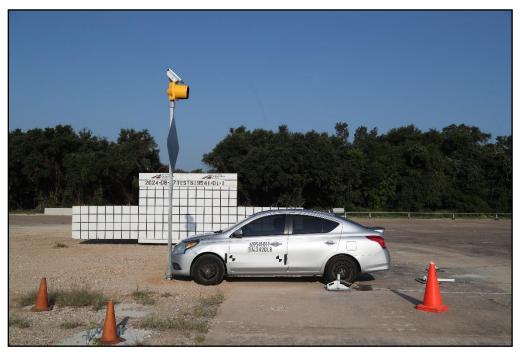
Breakaway Sign Support System with Flashing Equipment/Test Vehicle Impact Location 619541-01-1.
